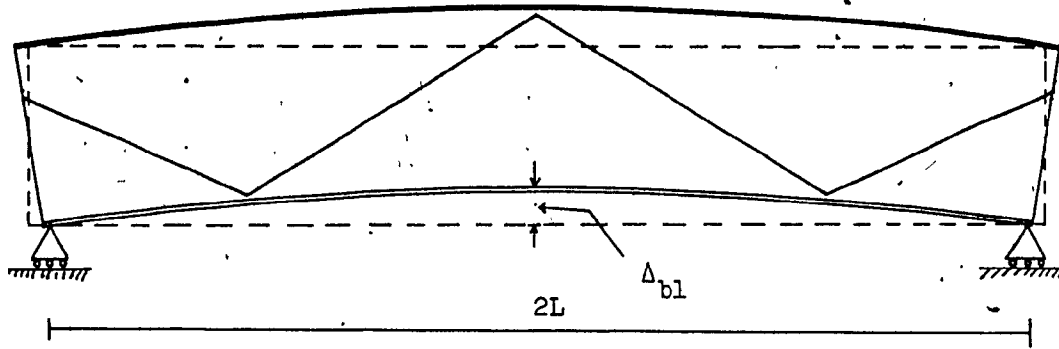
Geometry of the Straight Draped Cable Arrangement.
